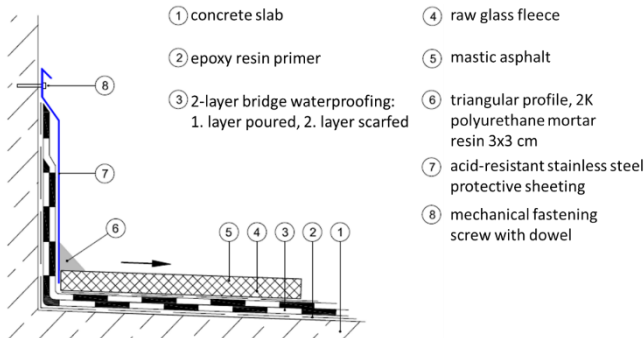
Pavement structure not exposed to weathering with 3.5 cm mastic asphalt layer in one layer on a 2-layer bituminous waterproofing layer
